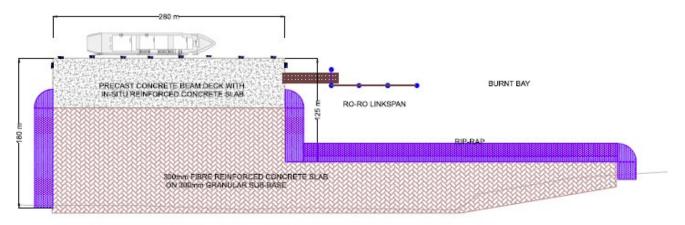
Plan of Berthing Quay, RORO and Dock
